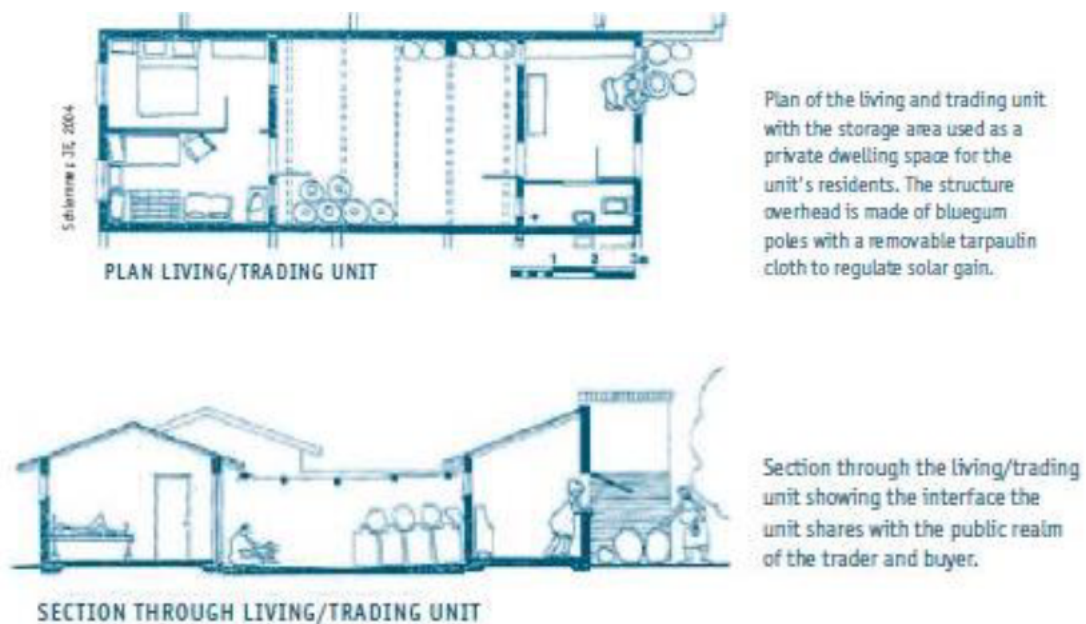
A section and plan of the trading living units. (Source: Kitchen, F. and Ovens, W. 2008).
